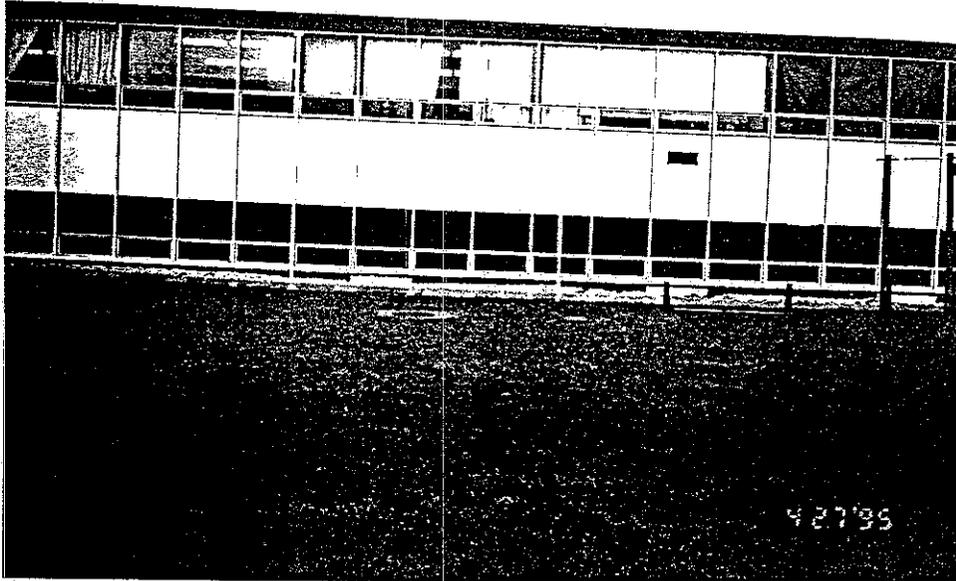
Date: April 27, 1995. Photo taken facing east.
